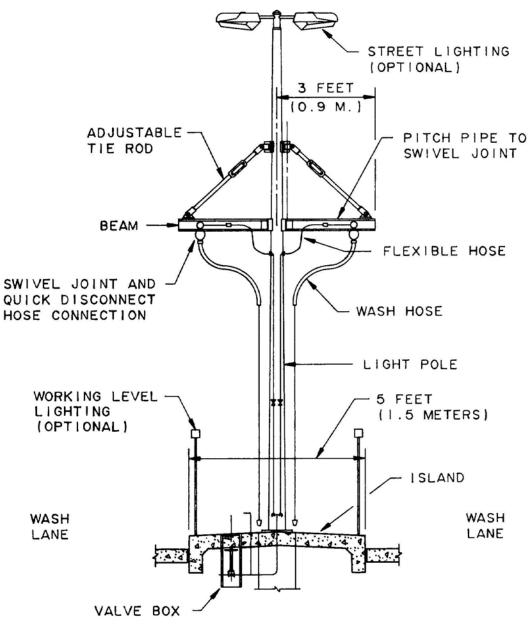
Wash tower island cross section (UFC 4-214-03, 2004).
